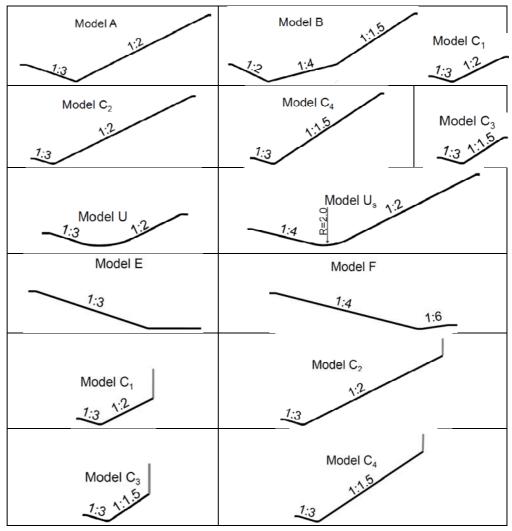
Tested roadside cross-sections. Model  $C_n$  with or without vertical wall.
